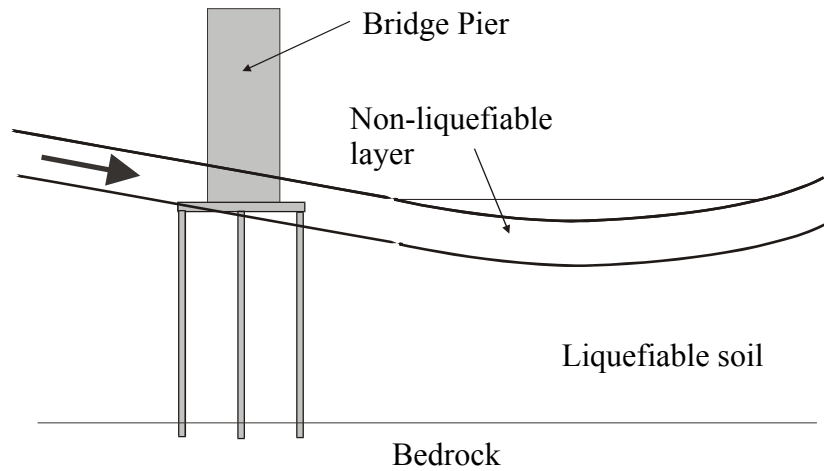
Schematic of layout at Nantou new bridge, Taiwan.
